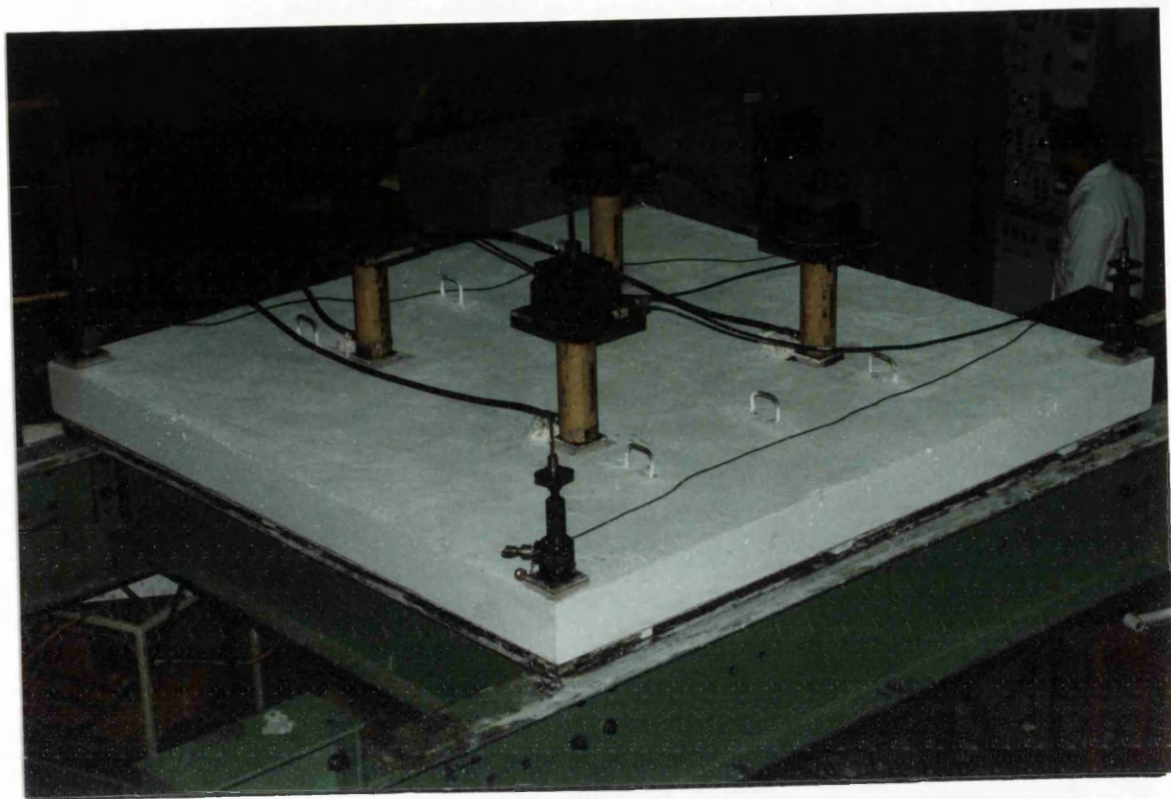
Loading arrangement. Model S.4 and S.6
